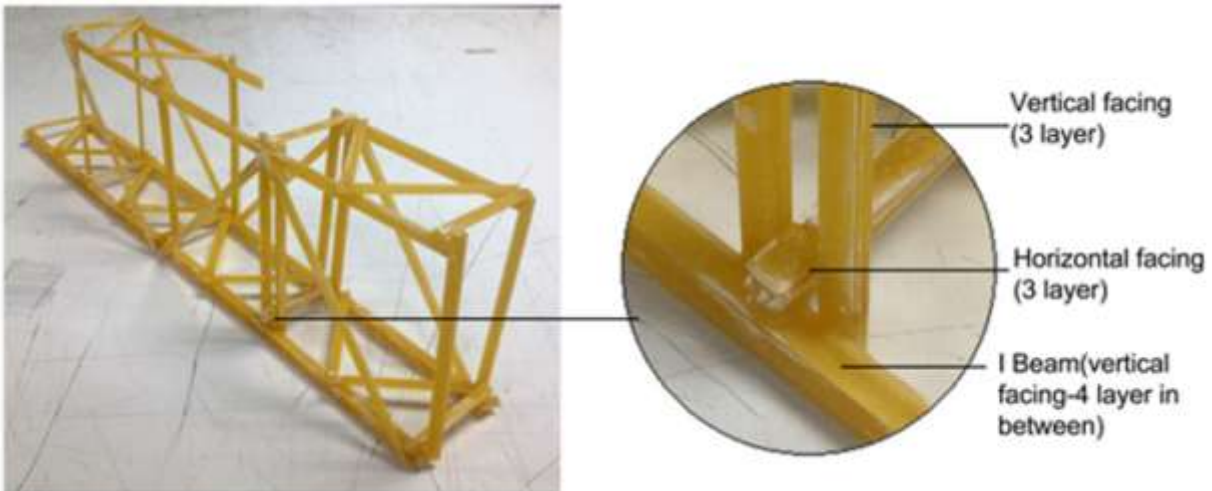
1    DETAIL OF WARREN BRIDGE
